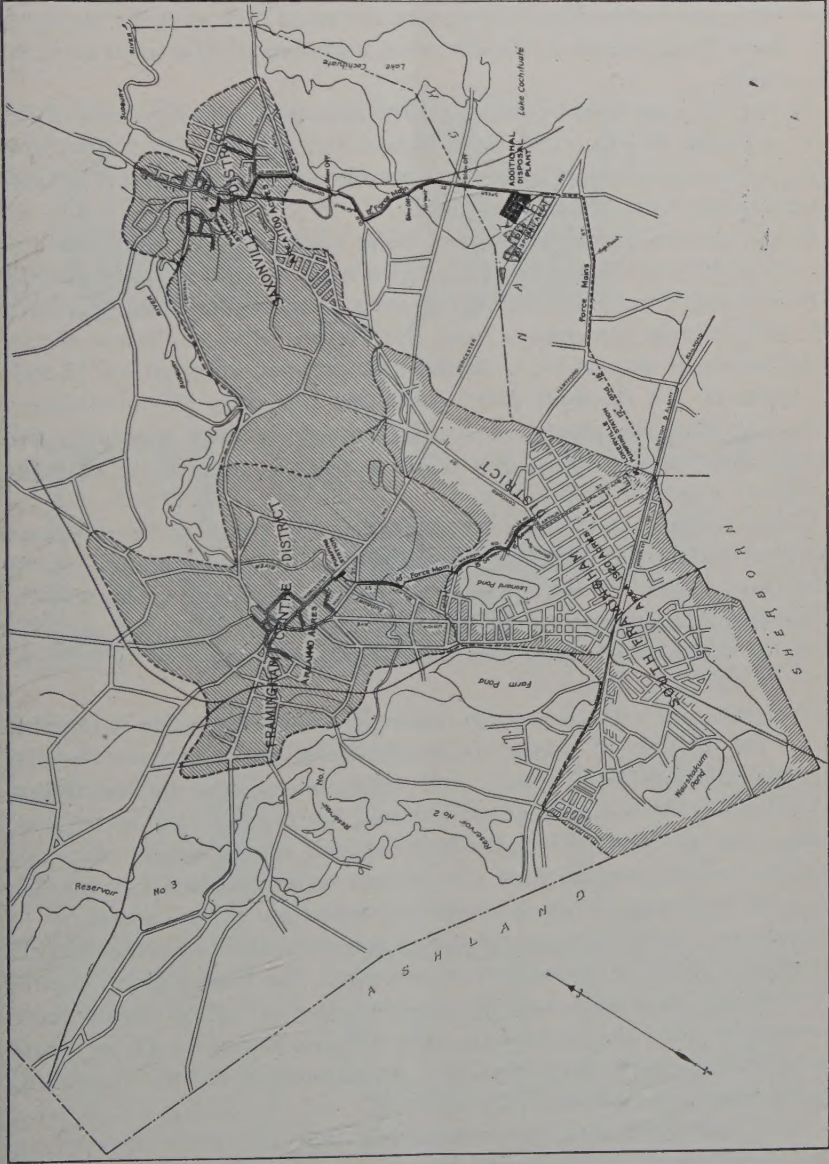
GENERAL PLAN SHOWING SEWERED AREA AND ADDITIONAL DISPOSAL PLANT
